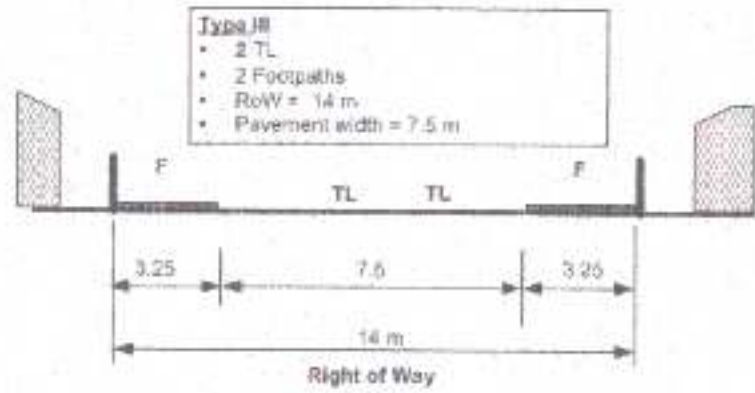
3 Typical Cross-section for Class A Roads (with RoW 14 m)
